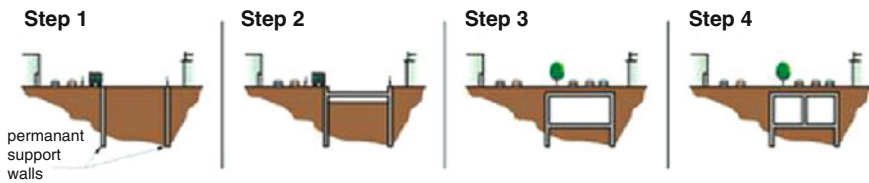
Stages of top-down construction of tunnels (Ref: <http://www.fhwa.dot.gov/bridge/tunnel/pubs/nhi09010/05.cfm>)
